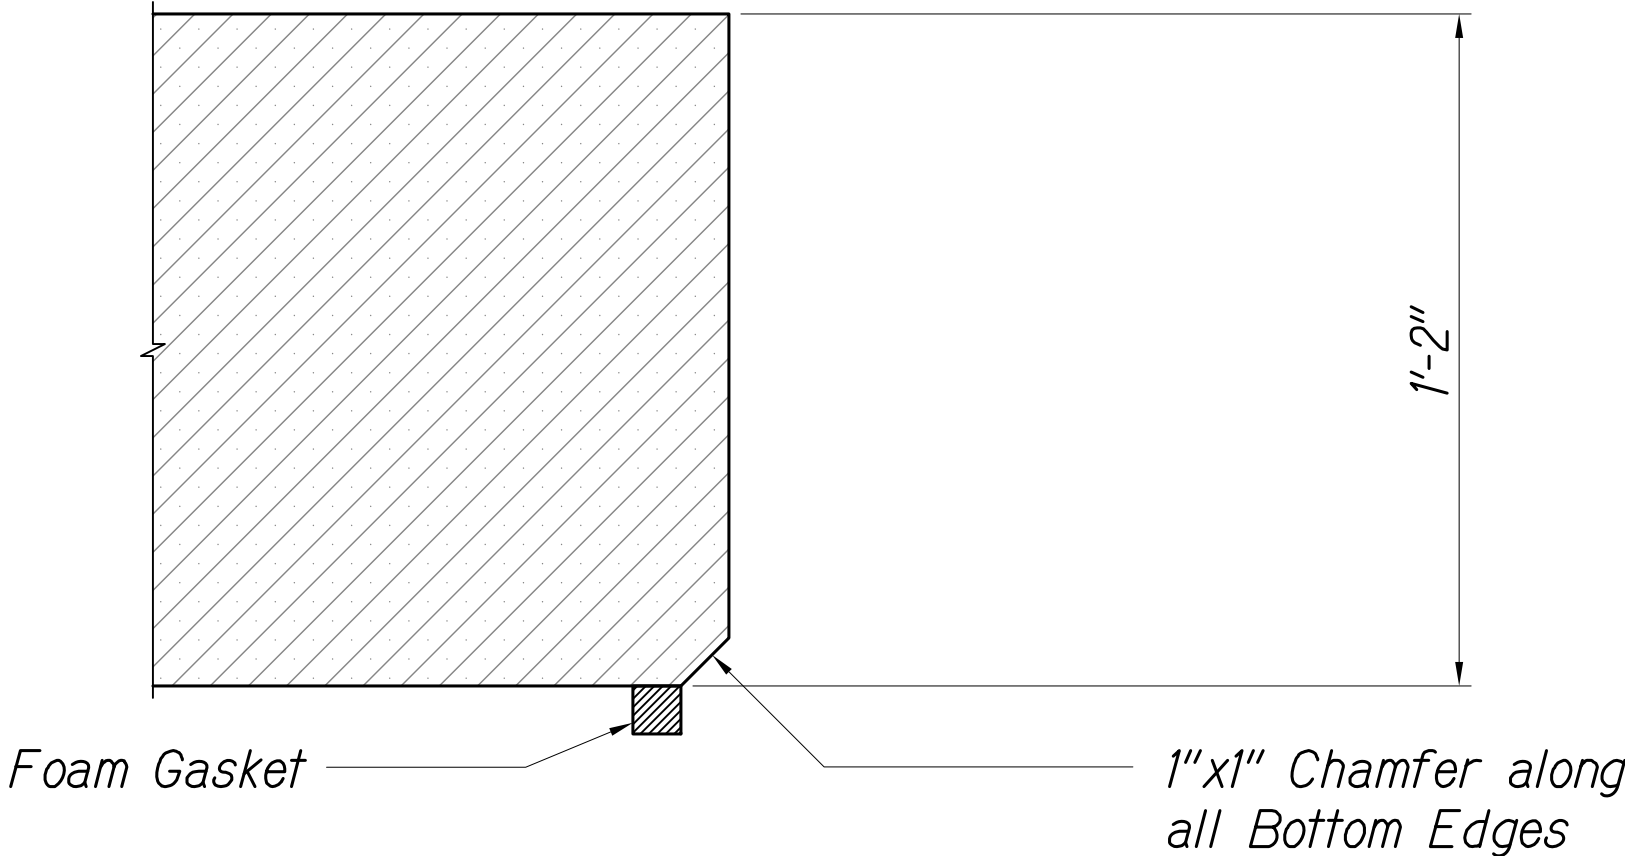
DETAIL (AT VIADUCT BACKWALL - PERPENDICULAR TO ABUTMENT)
